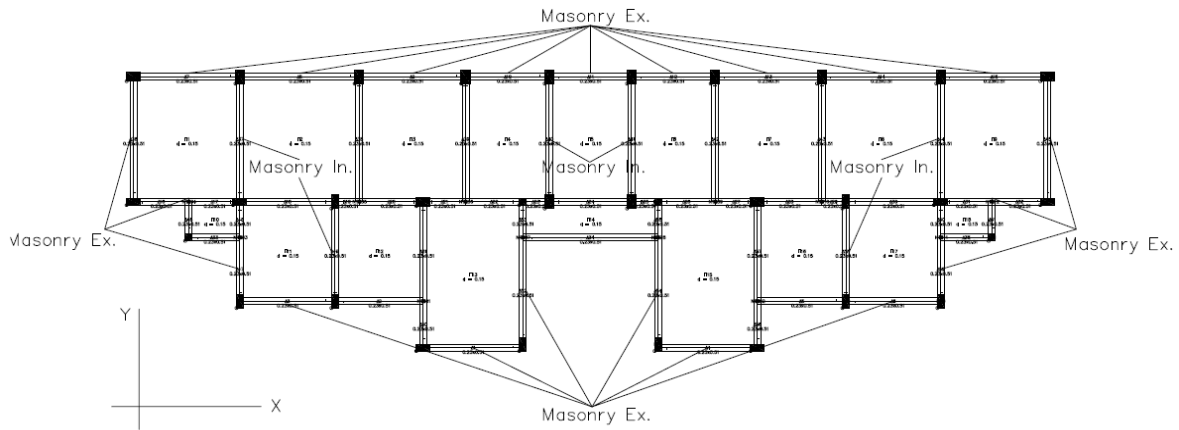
Typical plan layout of a 4-story residential index building from India
